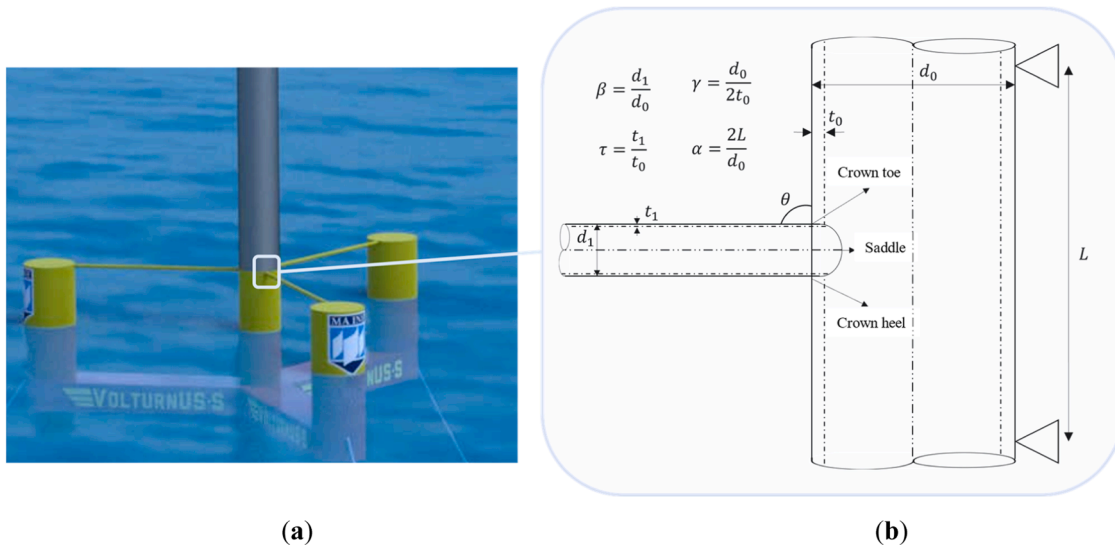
Fatigue-critical welded-tubular joint of the FOWT in question (a) Location (b) Geometrical details.
